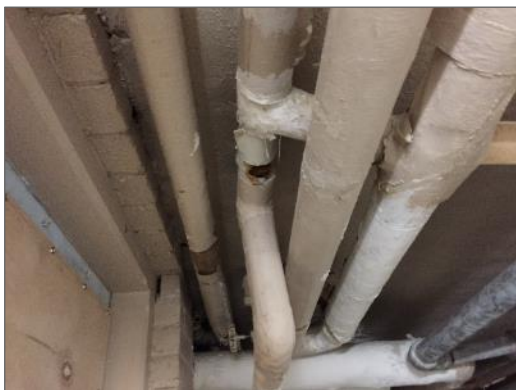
Parging cement in fair condition, South Corridor, M Wing Basement.
